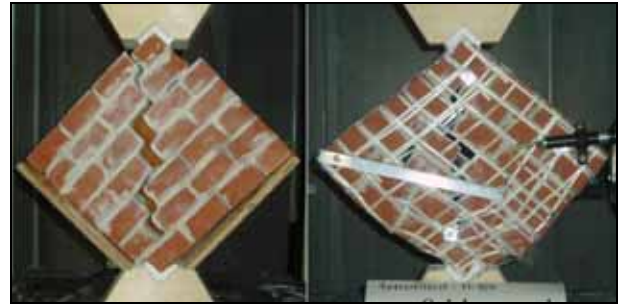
Failure patterns of brick masonry wallettes with retrofitting (left) without retrofitting (right)
